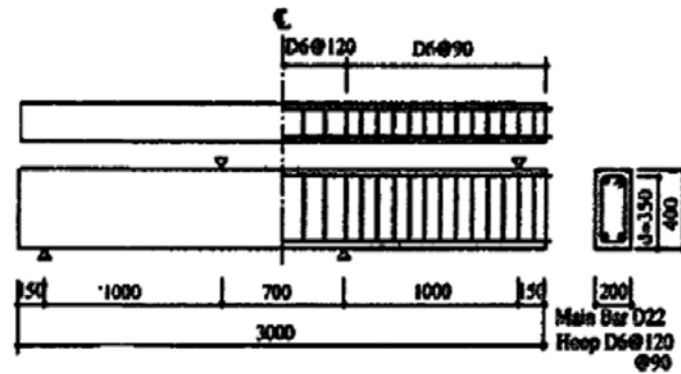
Dimensions and reinforcing details of specimens (Maruta et al., 1995)
